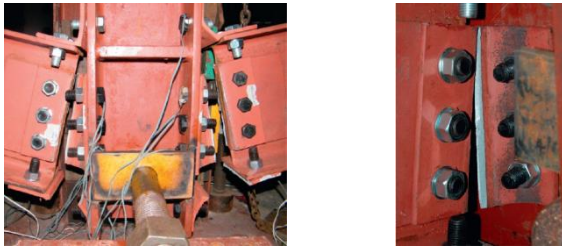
Collapse tests of beam–column assemblies with DWA and TSDWA connections [15] (dimension units: mm)
